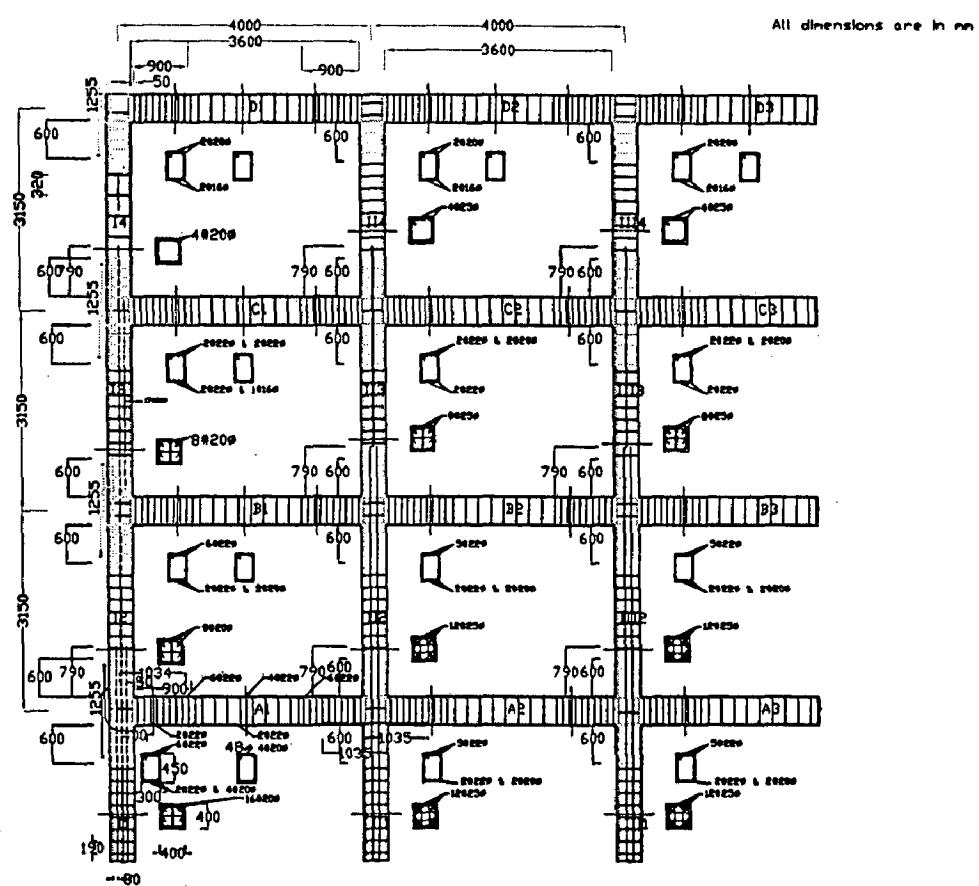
Details of beam and column reinforcement of exterior frame for Zone V
